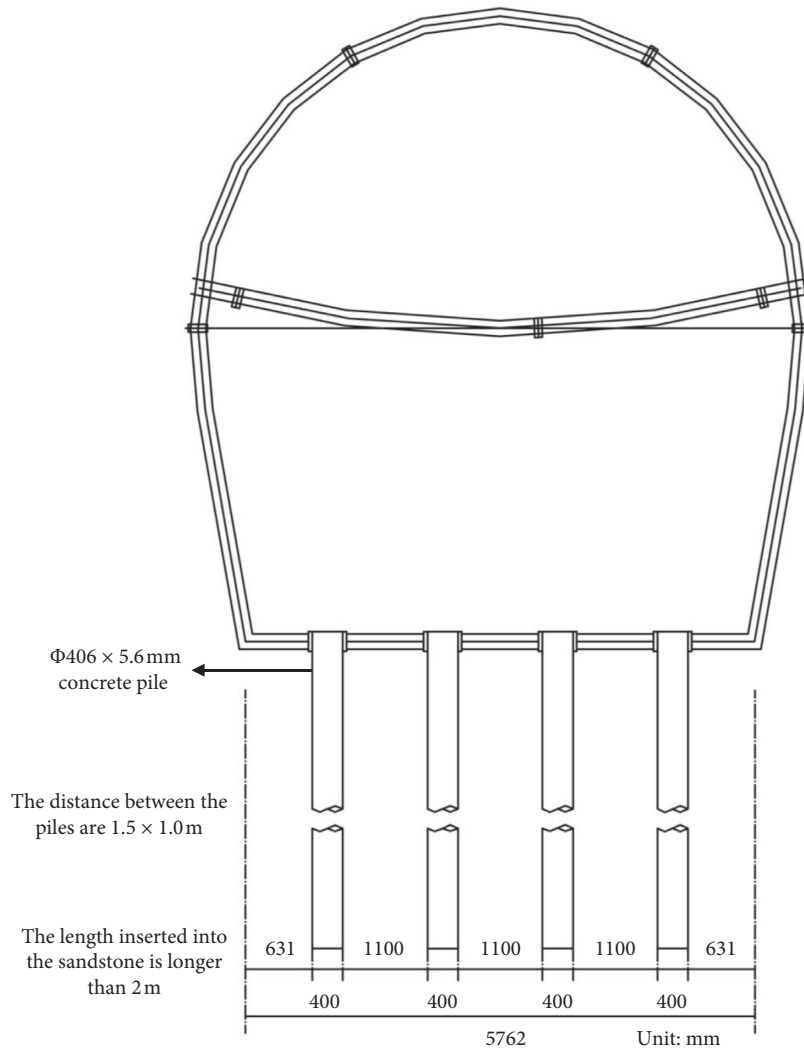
The reinforced section view of the steel tube concrete pile.
